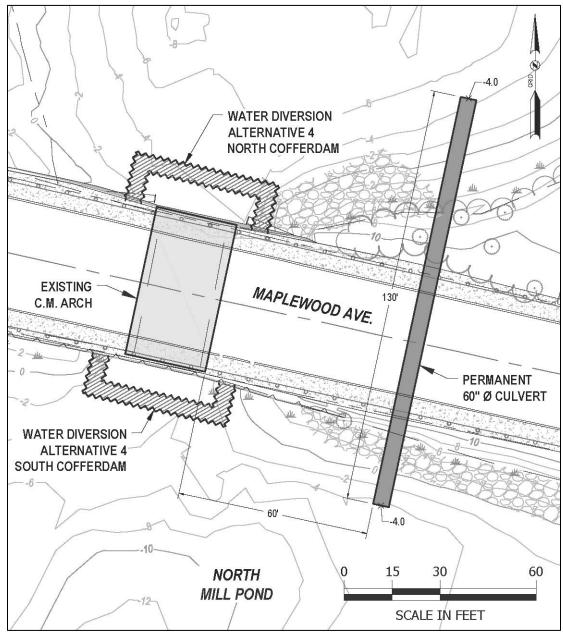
Water Diversion Alternative 4 Schematic Plan
